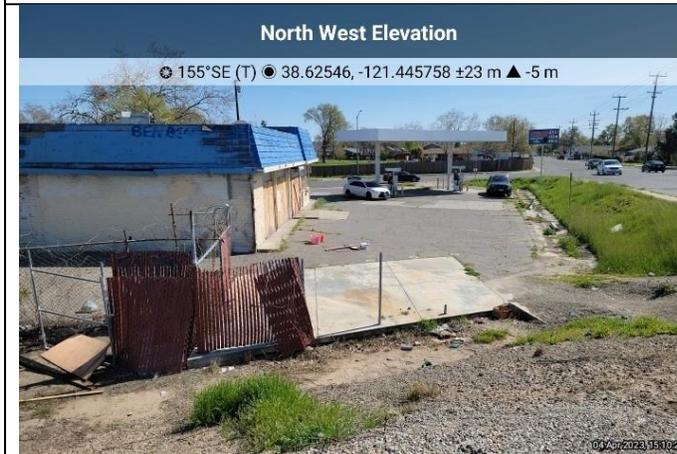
Subject property from Arcade Creek access road. View southeast.
